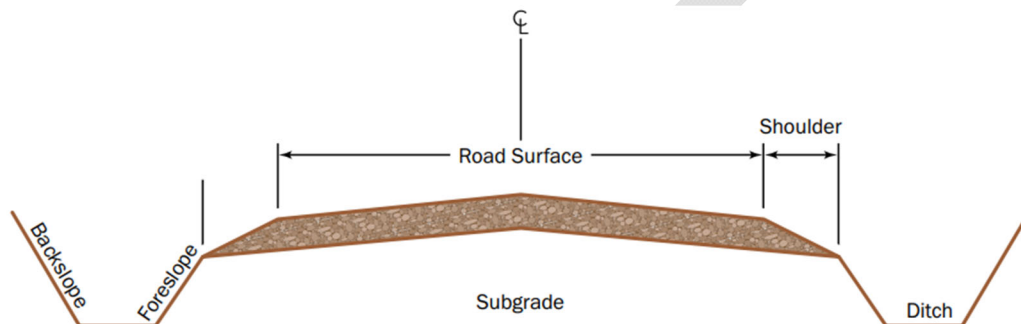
Source - FEMA Hurricane and Flood Mitigation Handbook for Public Facilities - Fact Sheet 1.1: Road and Highway Surfaces
